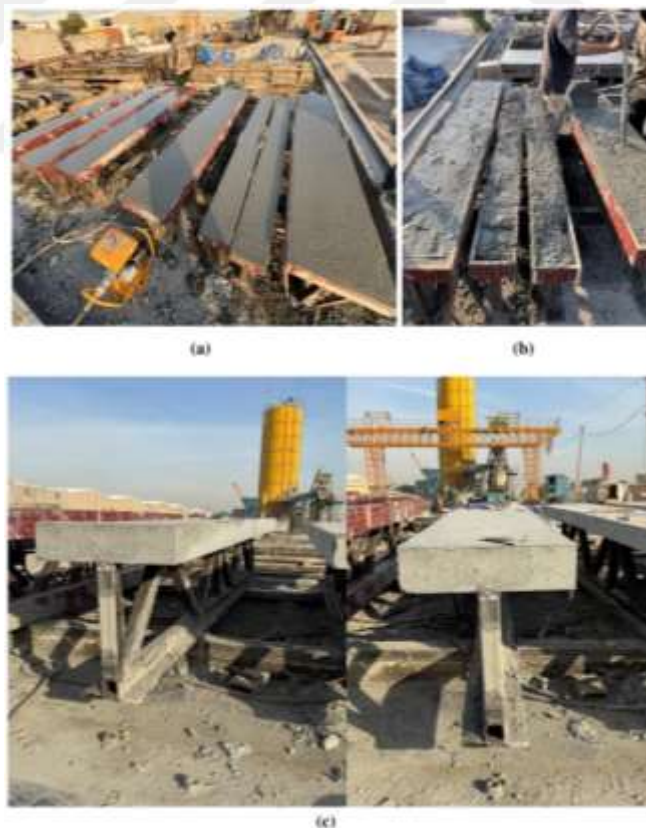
Steps of Poring and Concrete Casting of the Main Truss Girder (SCTG) and (DCTG). (a) Final Poring Shape of all Specimens, (b) Mix Distribution with Vibration Tools, (c) Concrete Casting Stage of the (SCTG)
